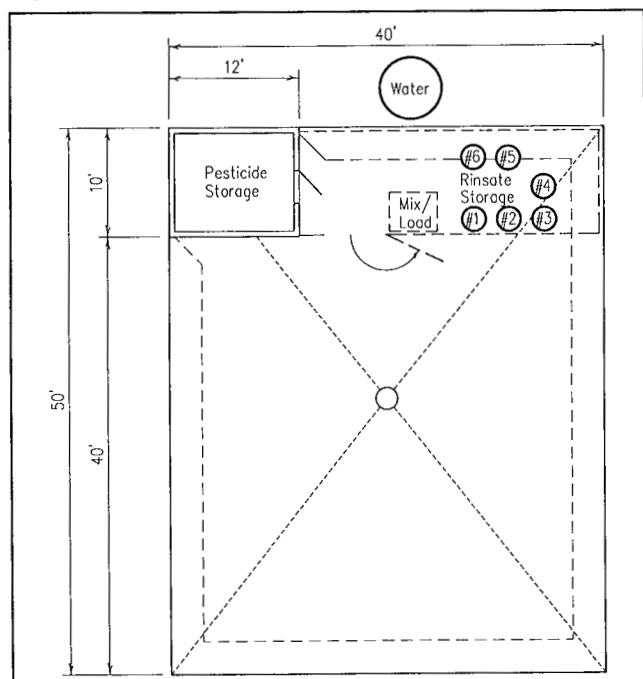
Rectangular single sump mixing/loading pad with storage building and fenced pesticide security area.
